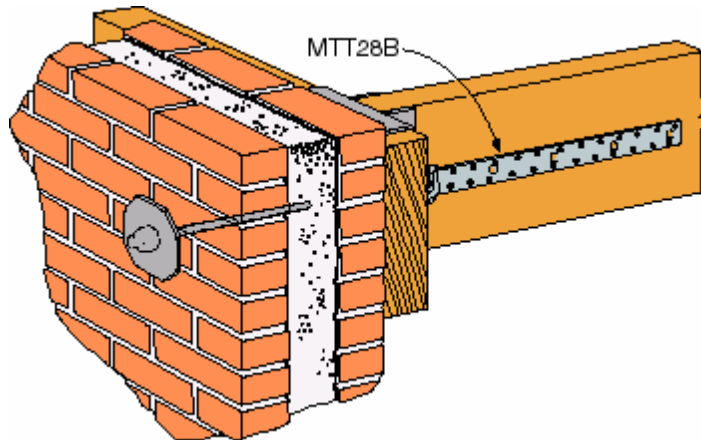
Schematic of installed joist anchor retrofit (taken from www.strong-tie.com).
